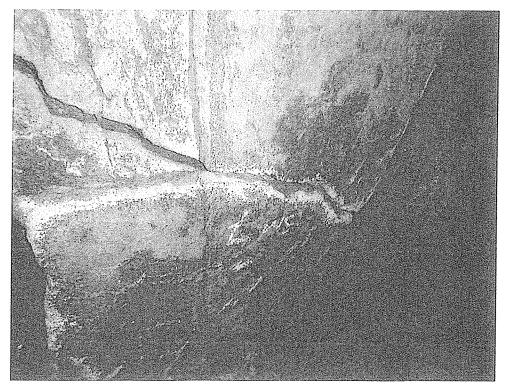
Slab 7-Full width crack ranging from 3/4" to 2".
